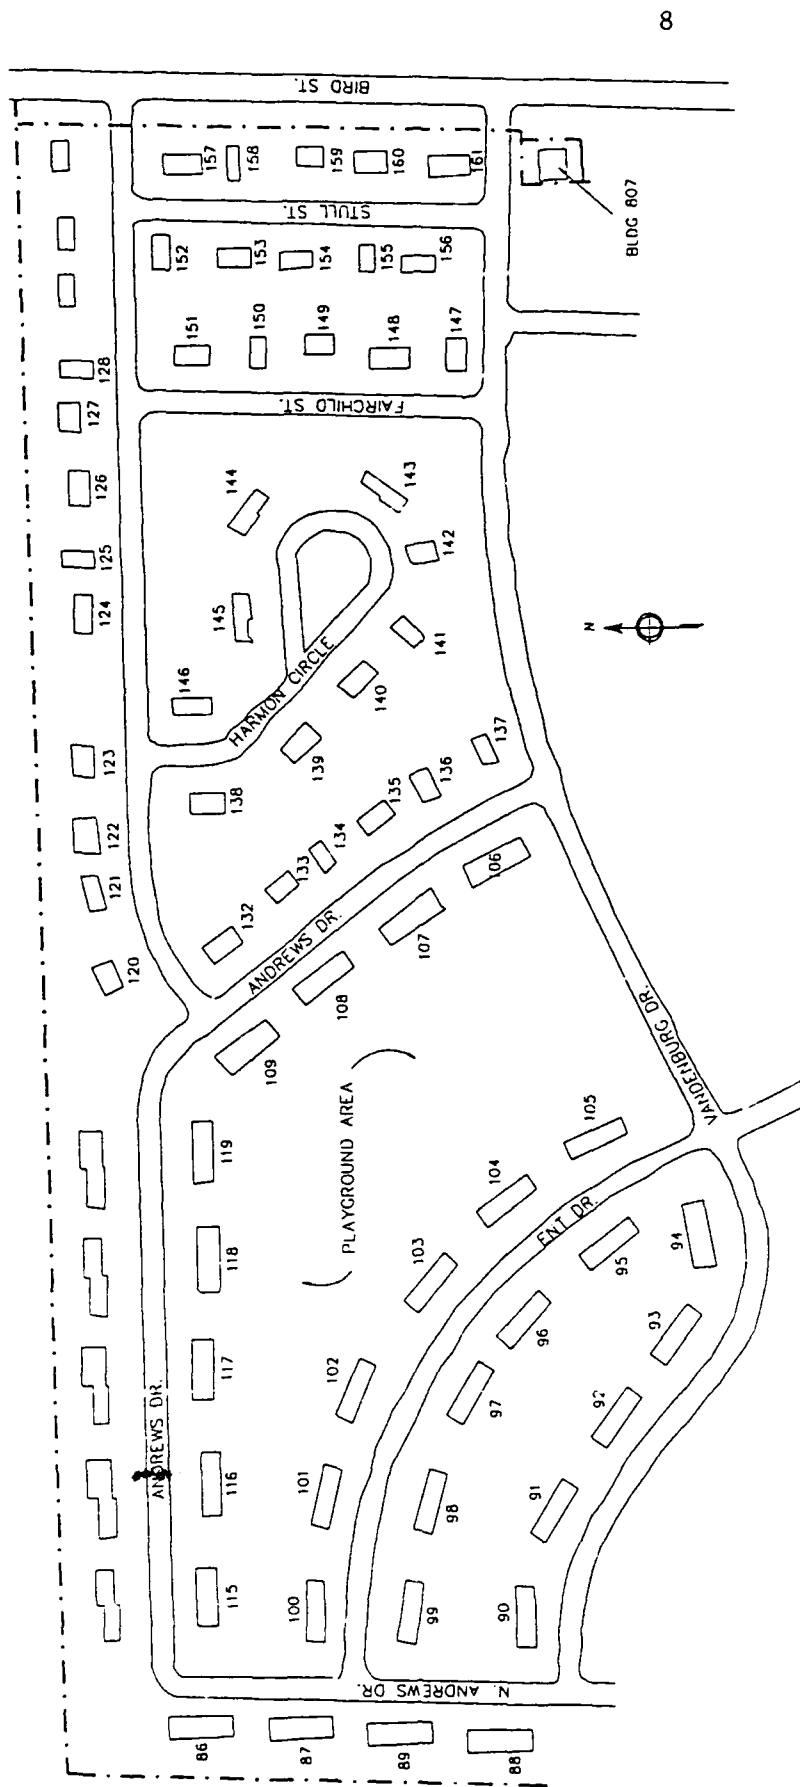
Site Plan Map of Sun Prairie Army Housing Units
